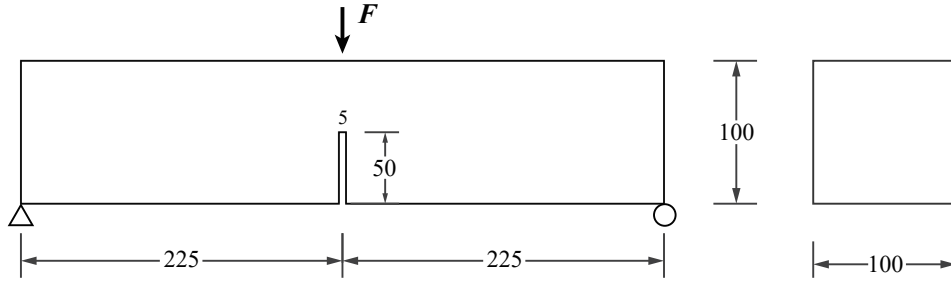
Geometry and boundary conditions of the notched TPB concrete beam (Unit: mm)
